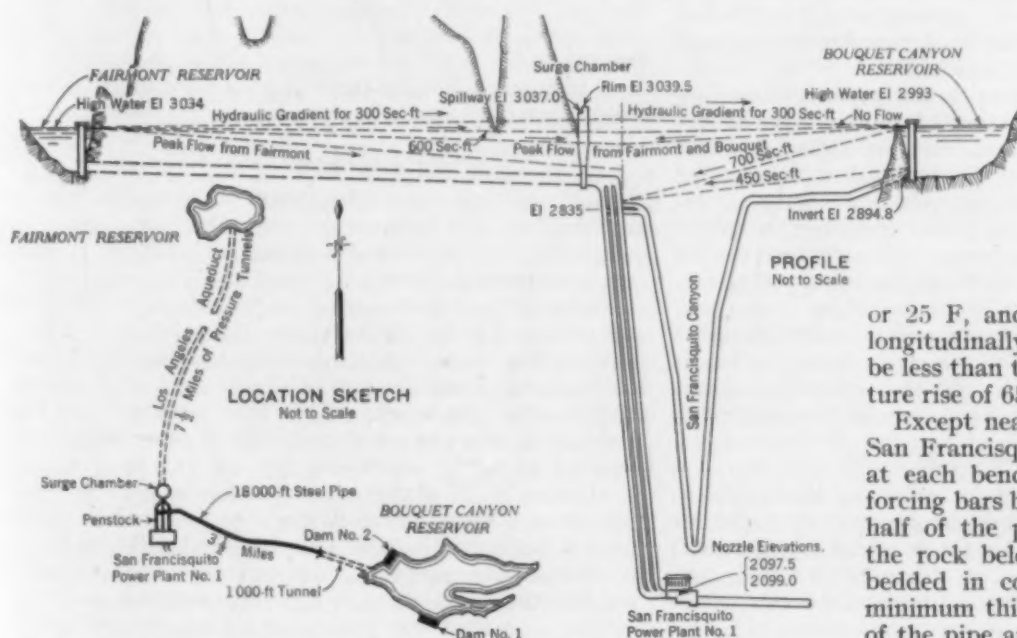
SKETCH PLAN AND PROFILE OF THE BOUQUET CANYON PIPE LINE
